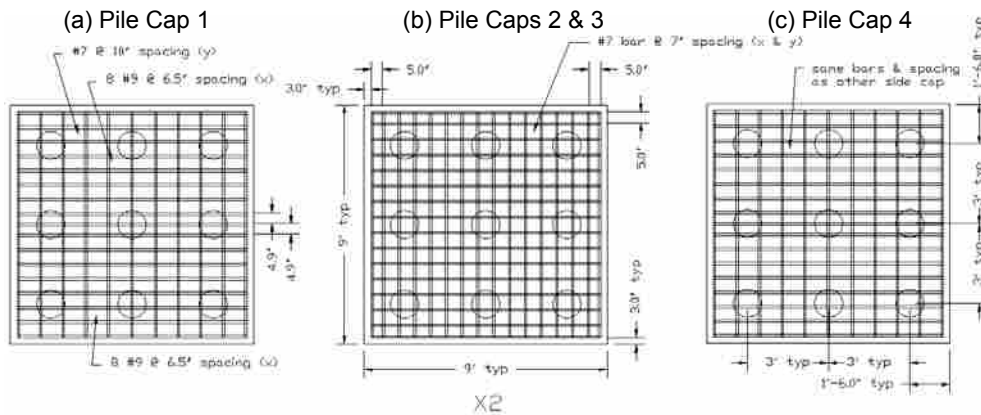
Layout of bottom reinforcing mat for the test pile groups.
